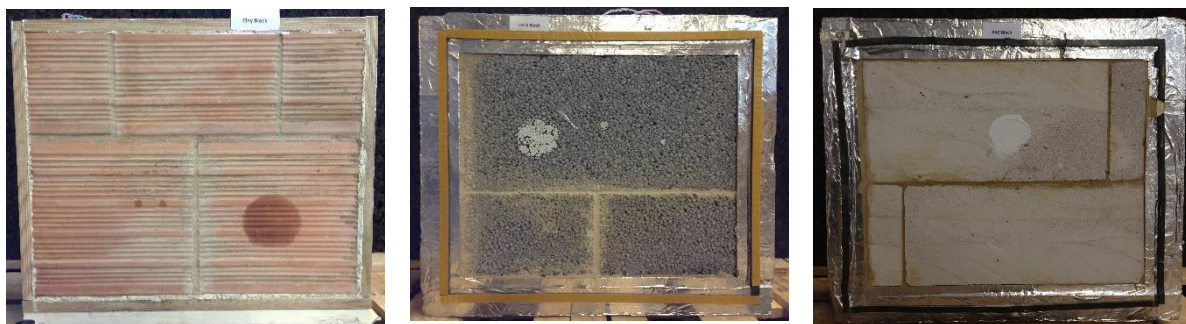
Uninsulated wall specimens; Fired clay, LECA and AAC block
